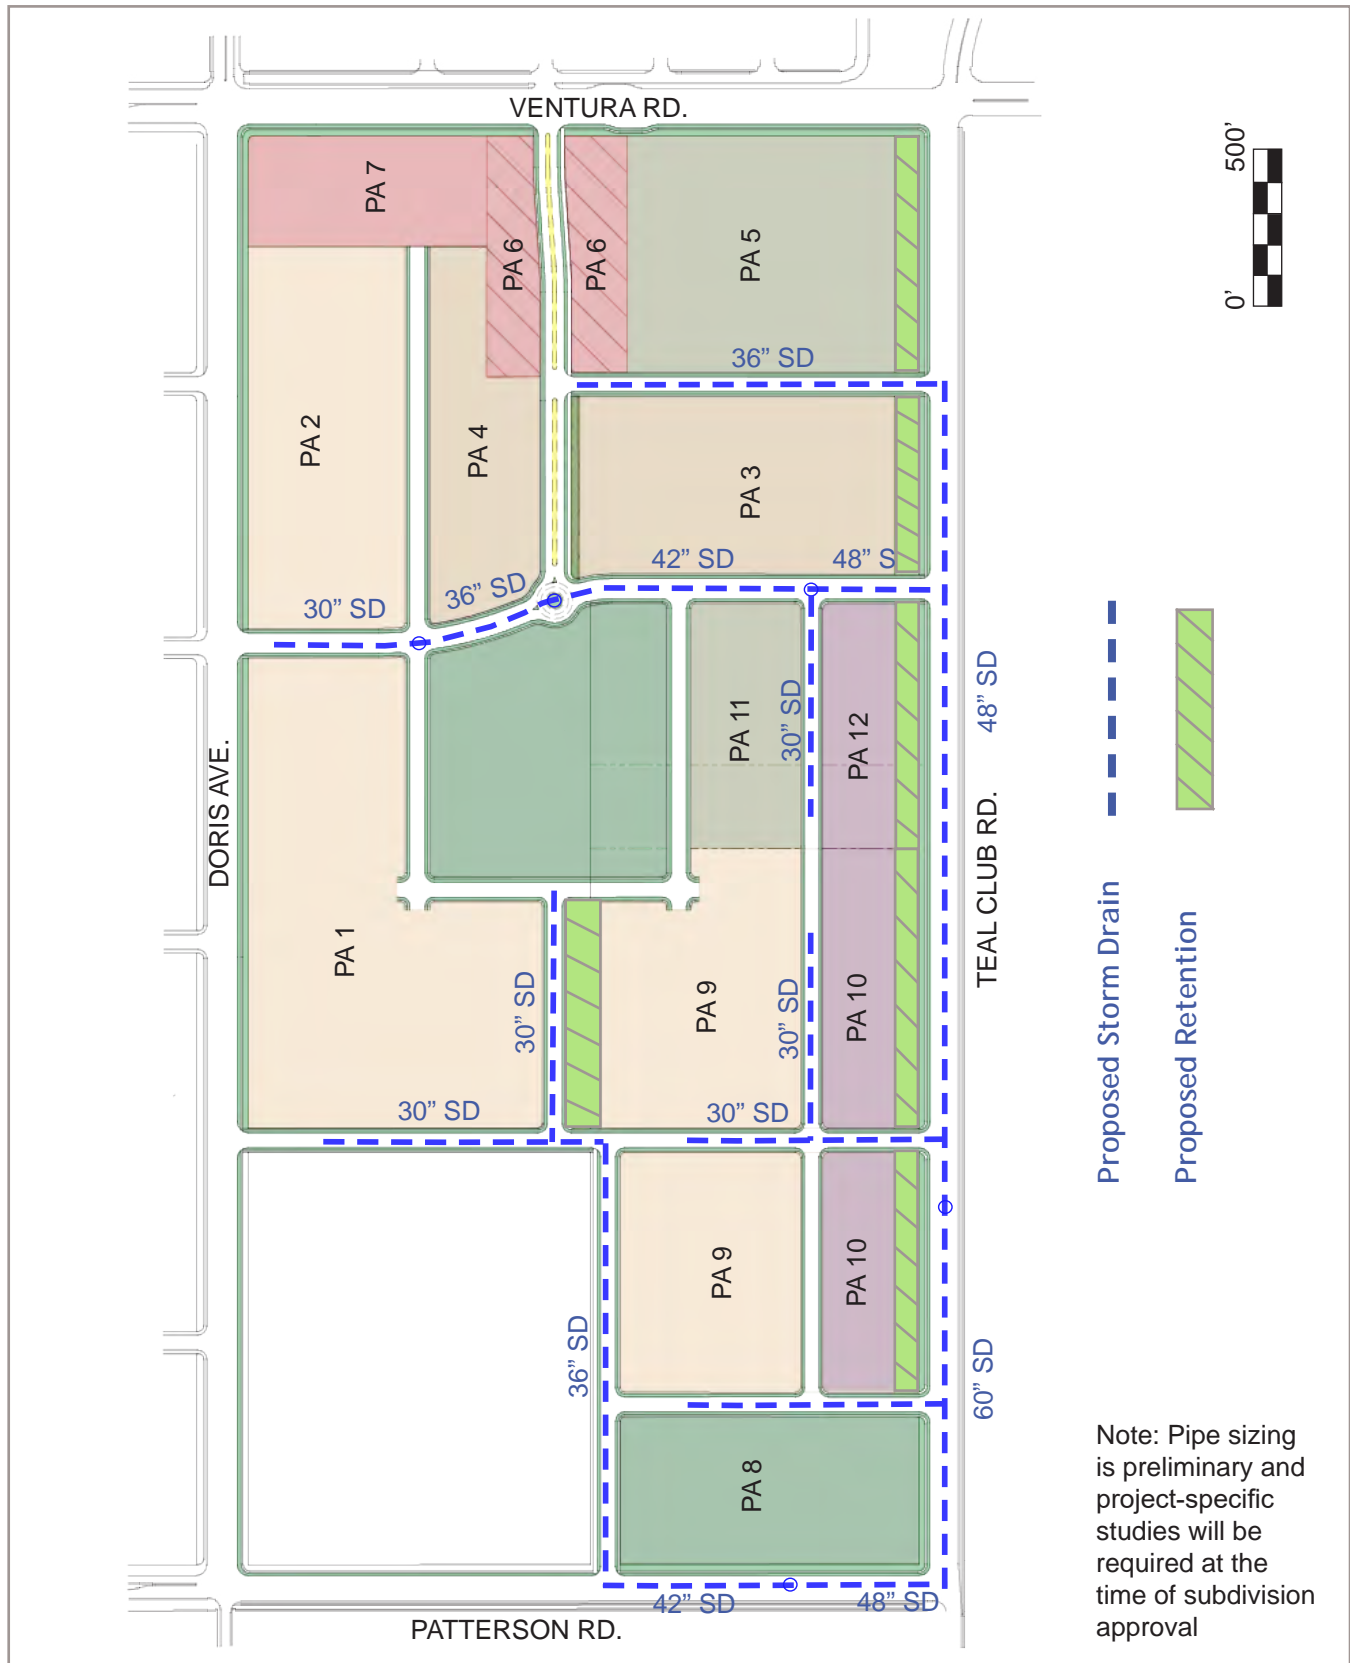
PROPOSED BUILD-OUT STORMWATER DRAINAGE SYSTEM
